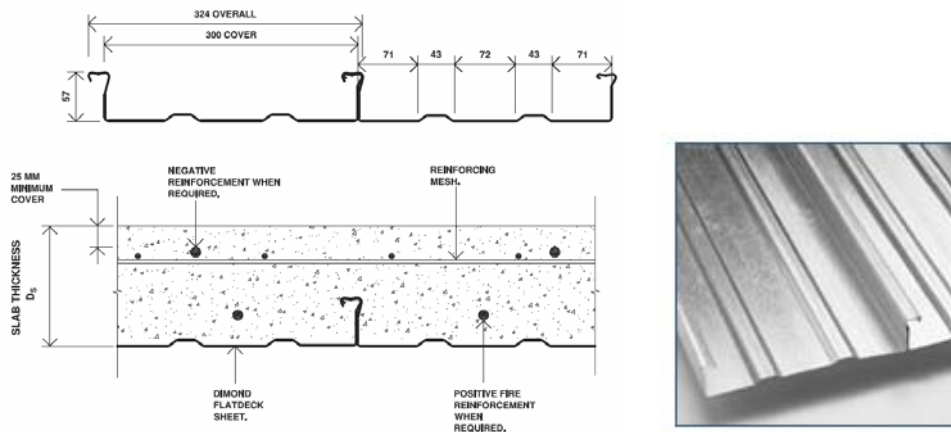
Cross-Section and Photo of Dimond Flatdeck Steel Tray
